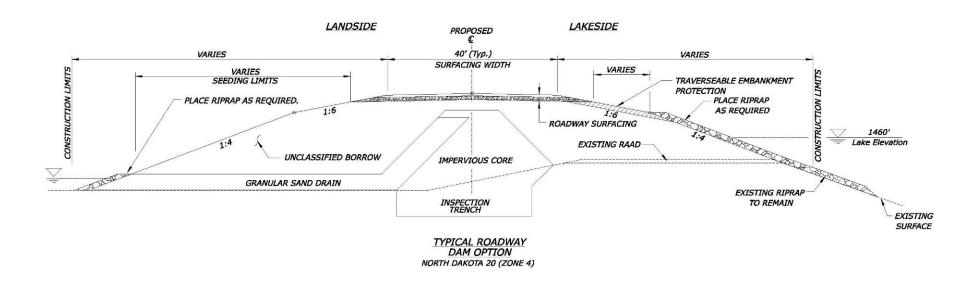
Typical Section for Building ND 20 as a Dam in Zone 4
